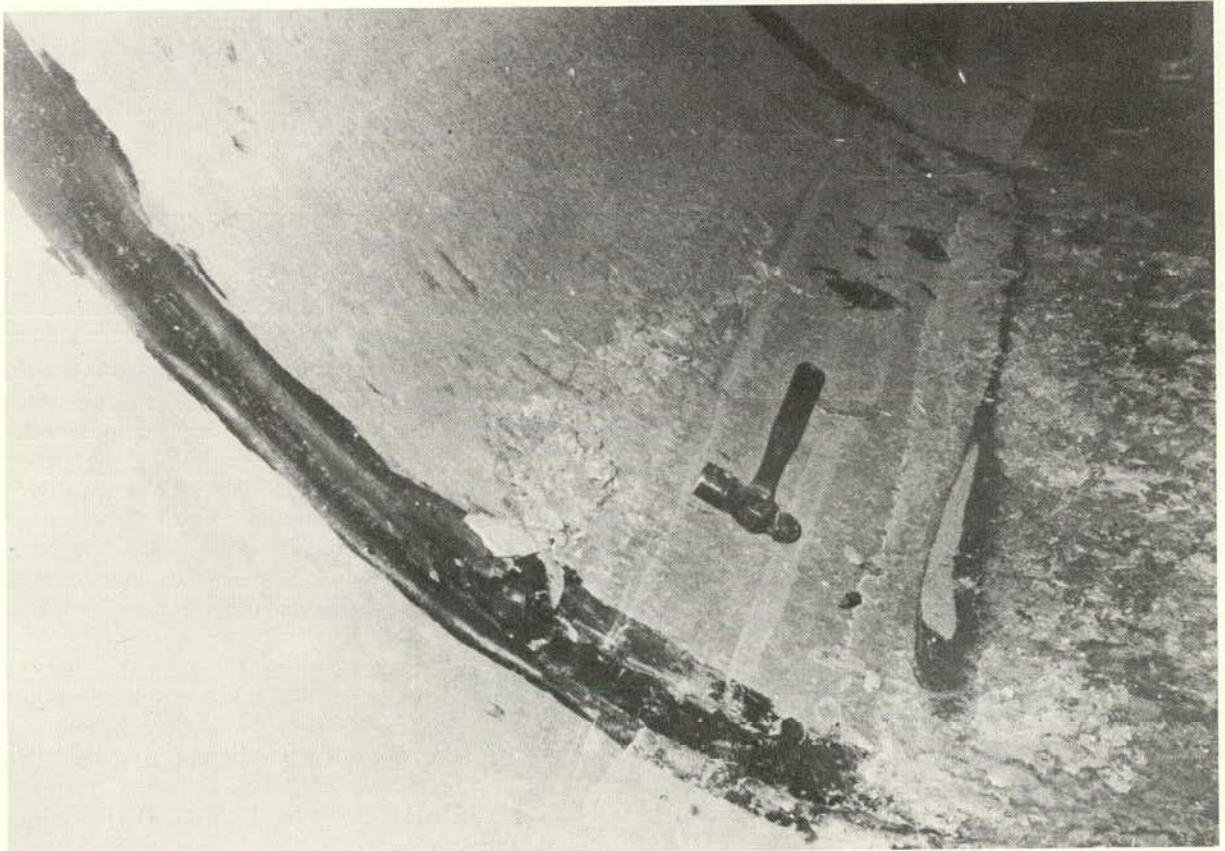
Spalled concrete in invert (Case 1).
